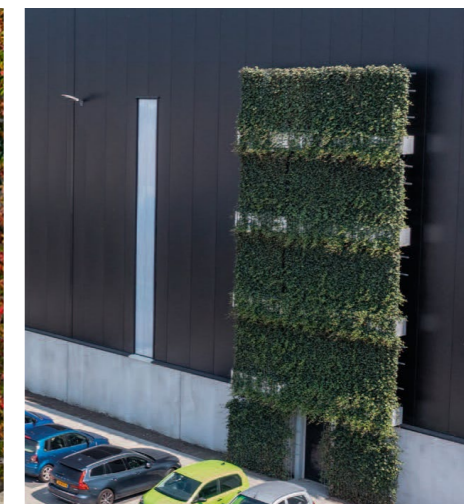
Indirect green façade rooted into aluminium planter boxes at several heights of the façade using a steel trellis support structure (system 4) (Mobilane, n.d.b)
